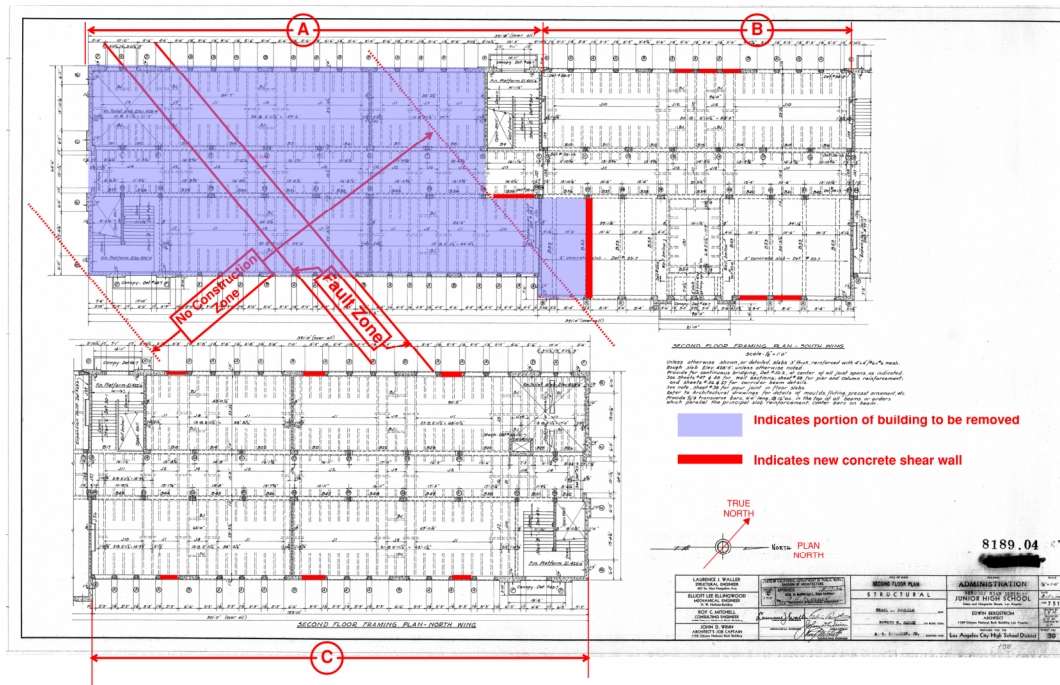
Conceptual plan showing keeping portion of structure not falling on No Construction Zone
